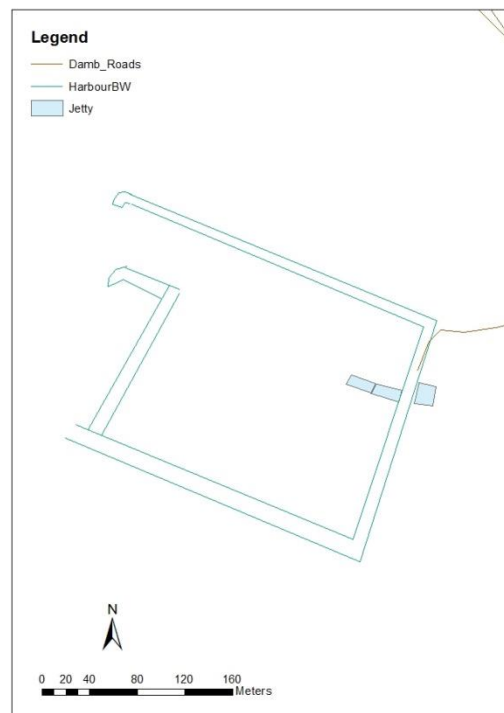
Layout and Design of constructed fish landing jetty and breakwater in the Miani Hor lagoon, at Damb village.
